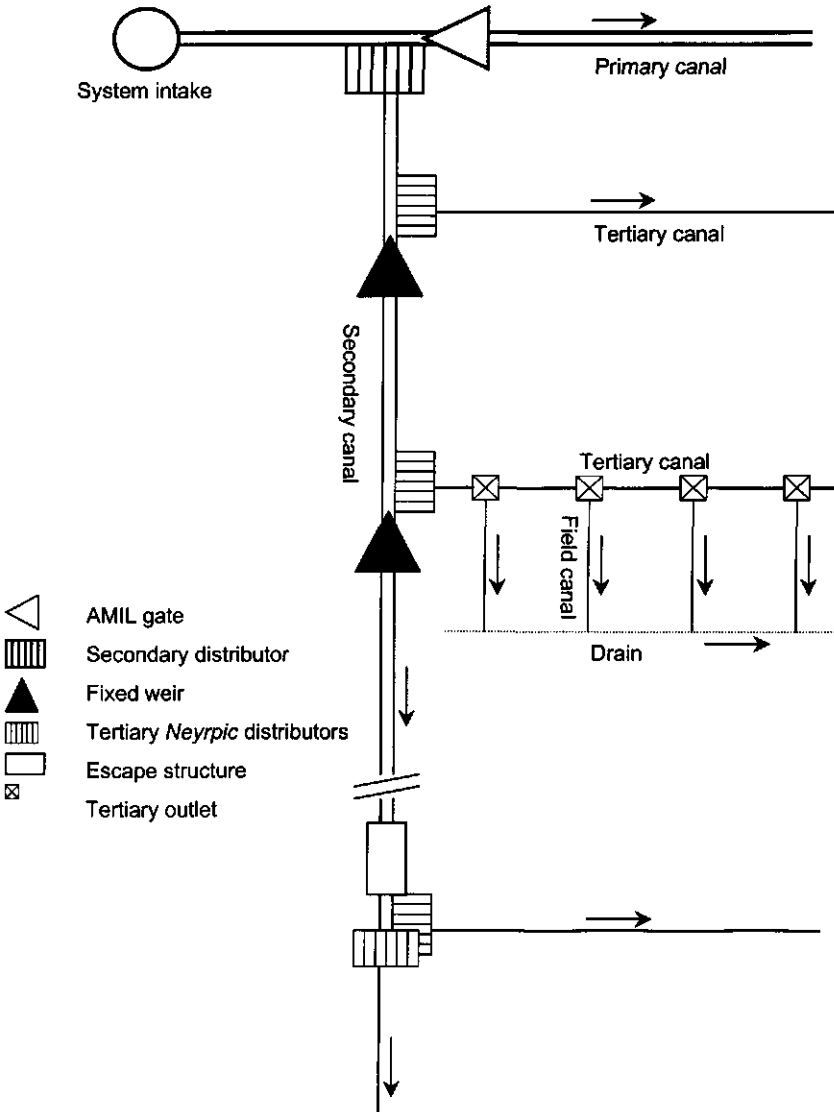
Schematic layout of the upstream control in the Tessaout Amont irrigation system.
